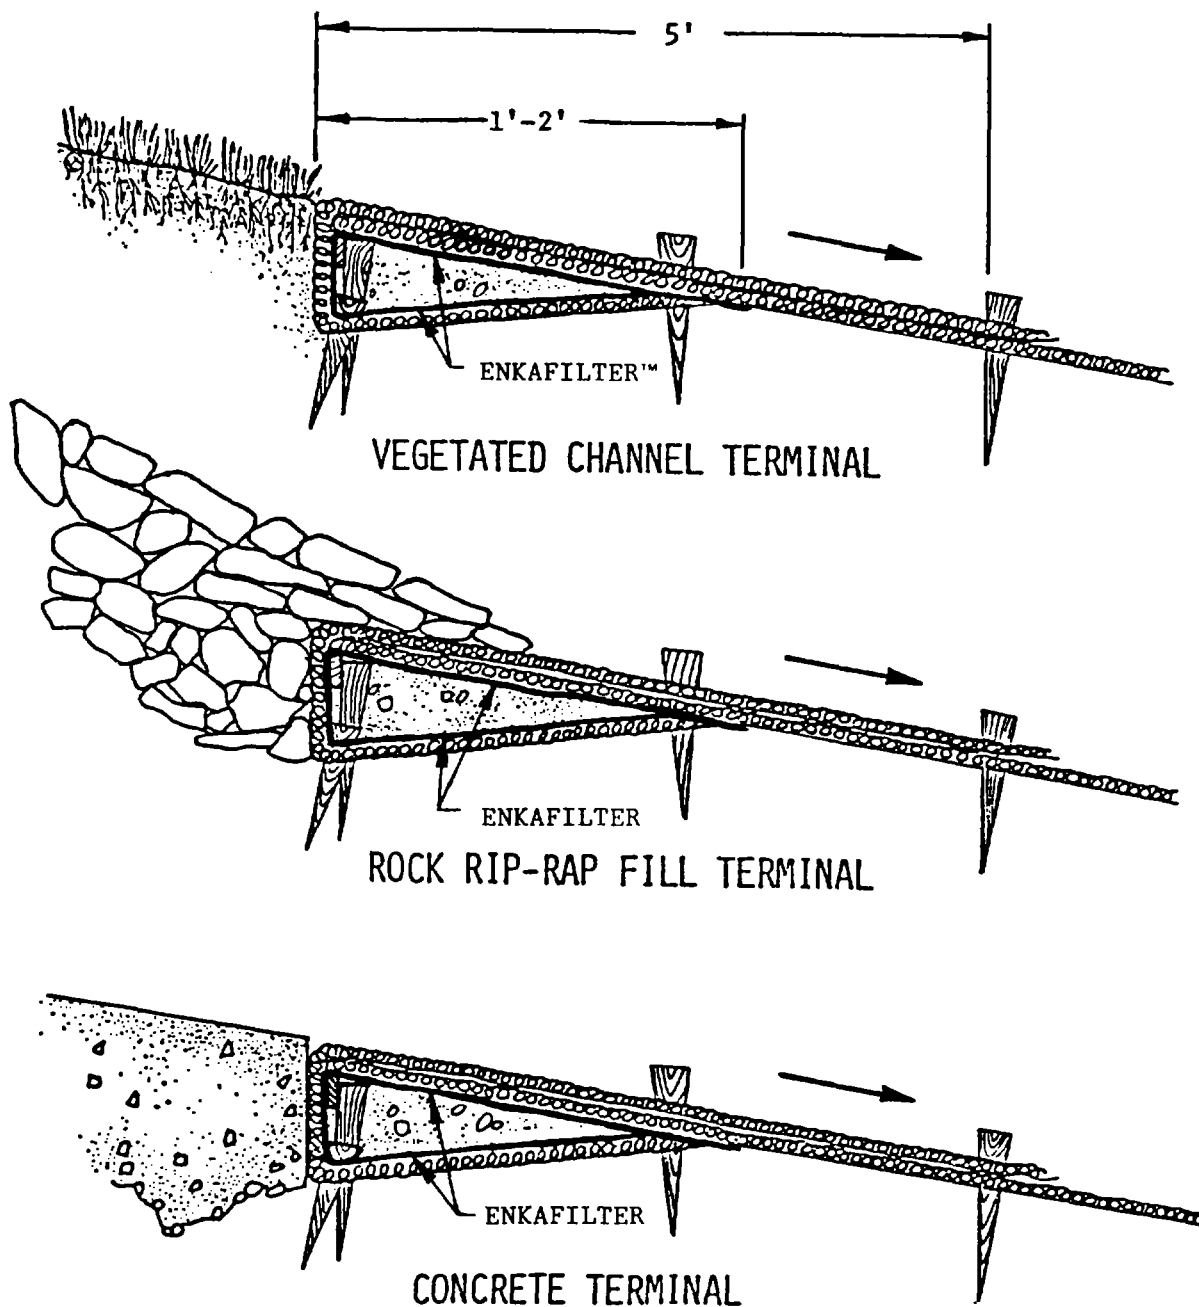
A - INSTALLING ENKAMAT® - REINFORCED CONSTRUCTION
